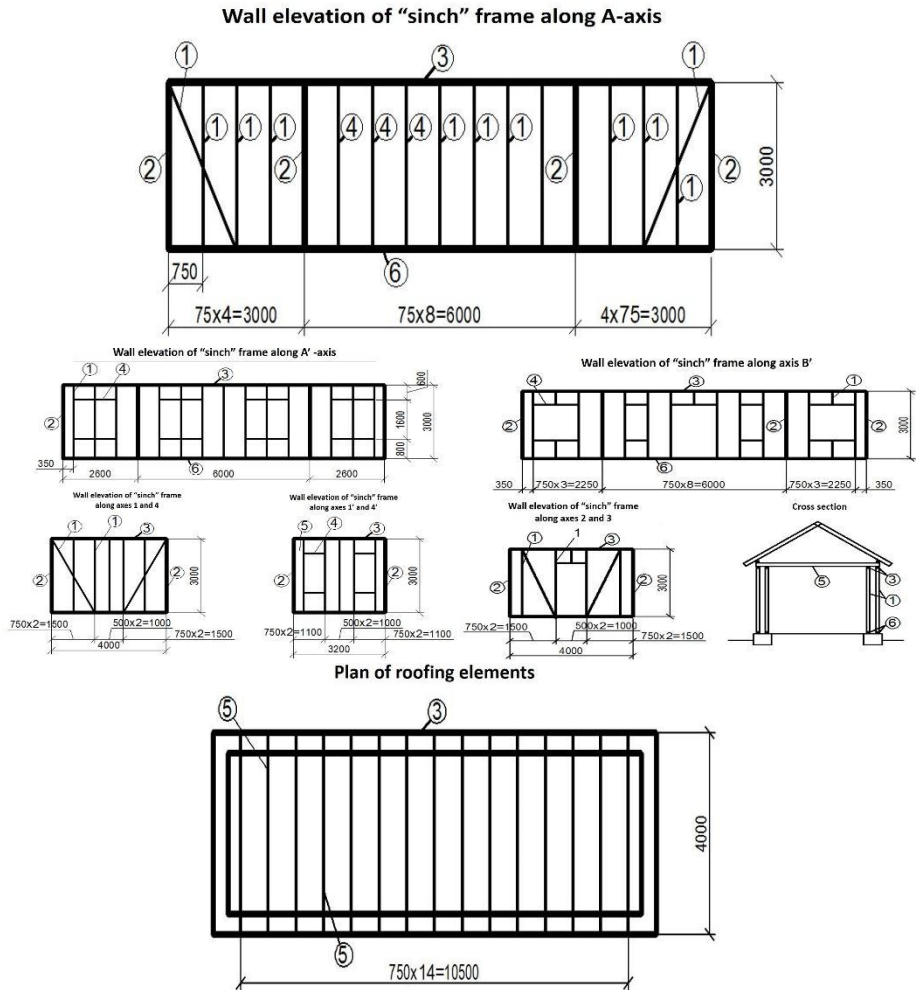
Wall plan, wall frame elevation along various axes and a schematic plan of roofing elements for options of problems No. 1, No. 2, and No. 3.
